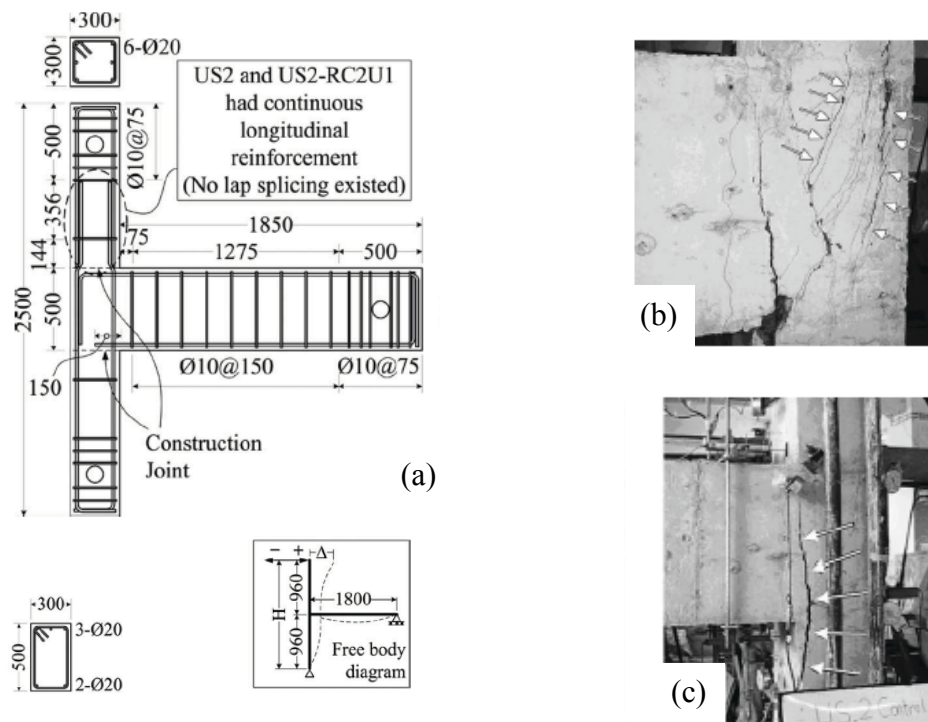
Experimental test by Parvin et al. (2010): (a) Reinforcing details and dimensions; (b) Crack pattern due to shear failure in the joint; (c) Crack pattern due to the slippage of the main beam bottom reinforcement.
